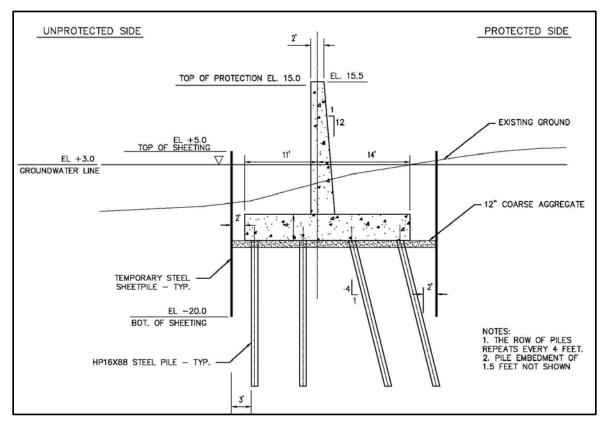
HSLRR-Revised Floodwall Section for 20-Foot Stem
